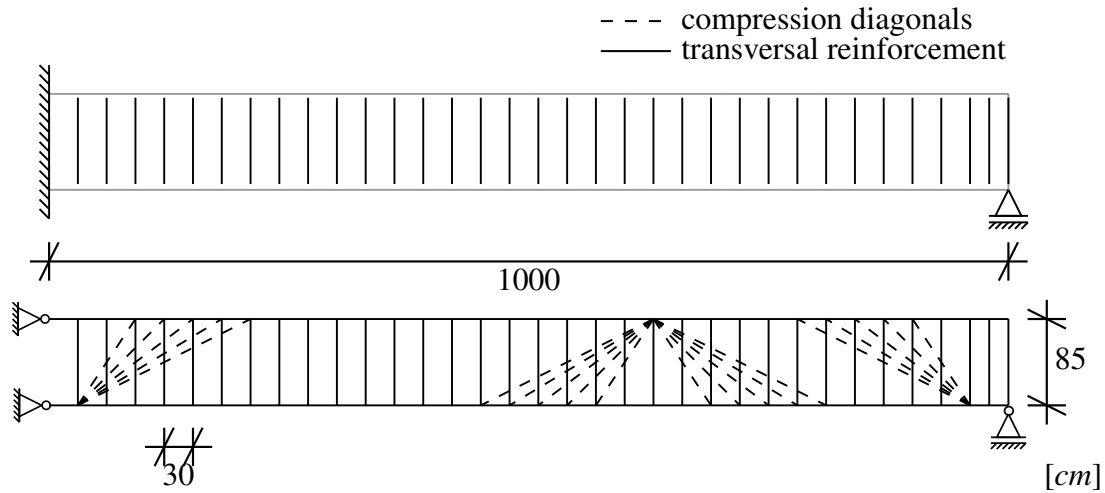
Beam T10-2-2 and its possible discrete trusses
